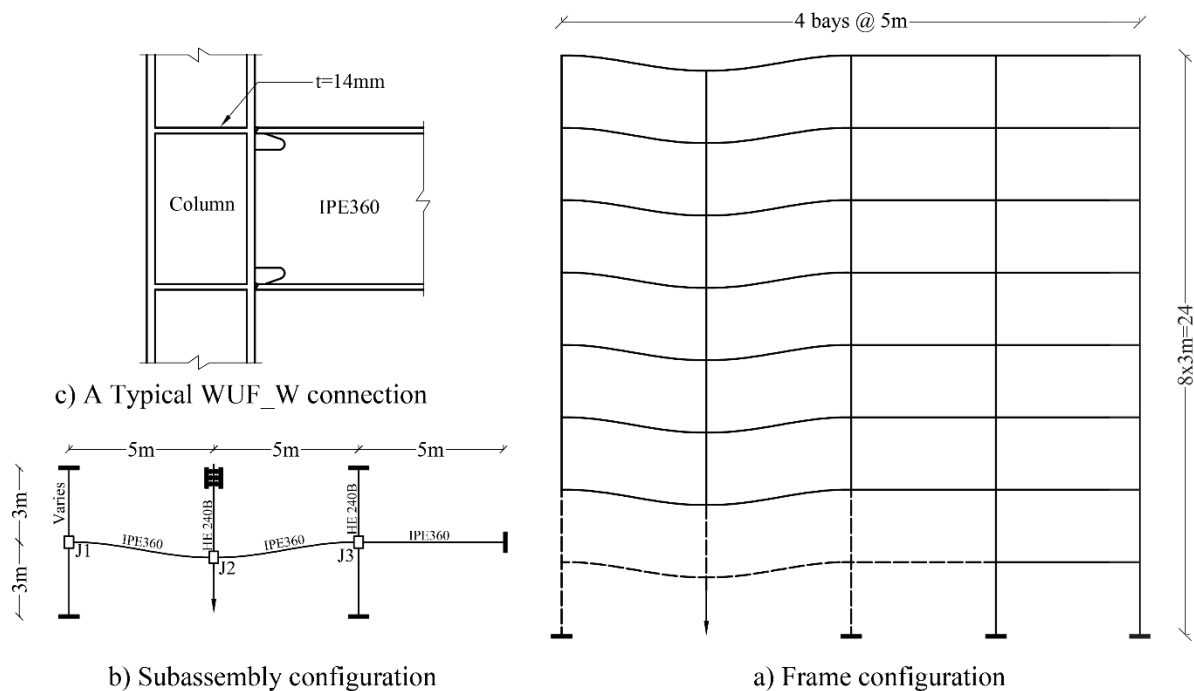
Configuration of a) the studied 8-story moment-resisting frame b) the subassembly c) Welded Unreinforced Flange-Welded web (WUF-W) connections.
